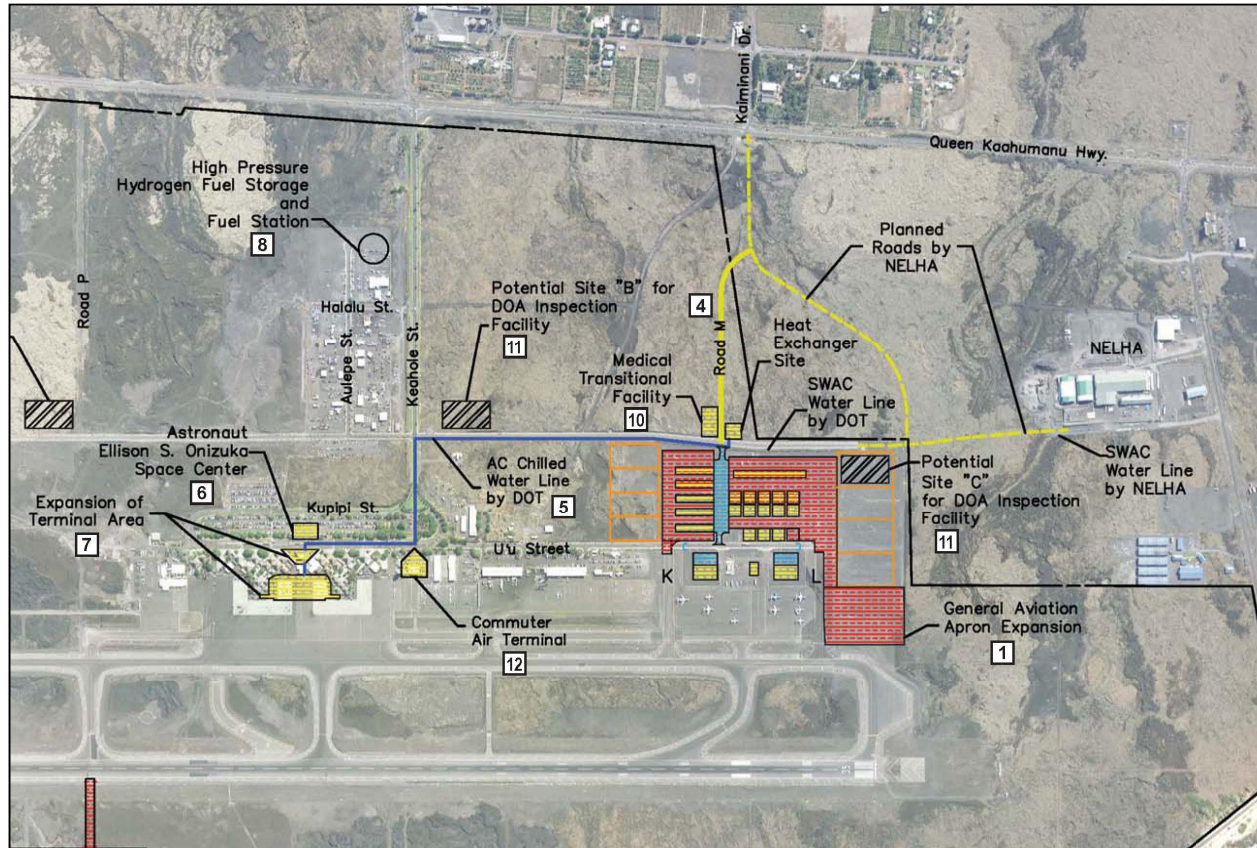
Portion of KOA Project Site Plan (portion of Figure 2-1 of KOA's EA)
